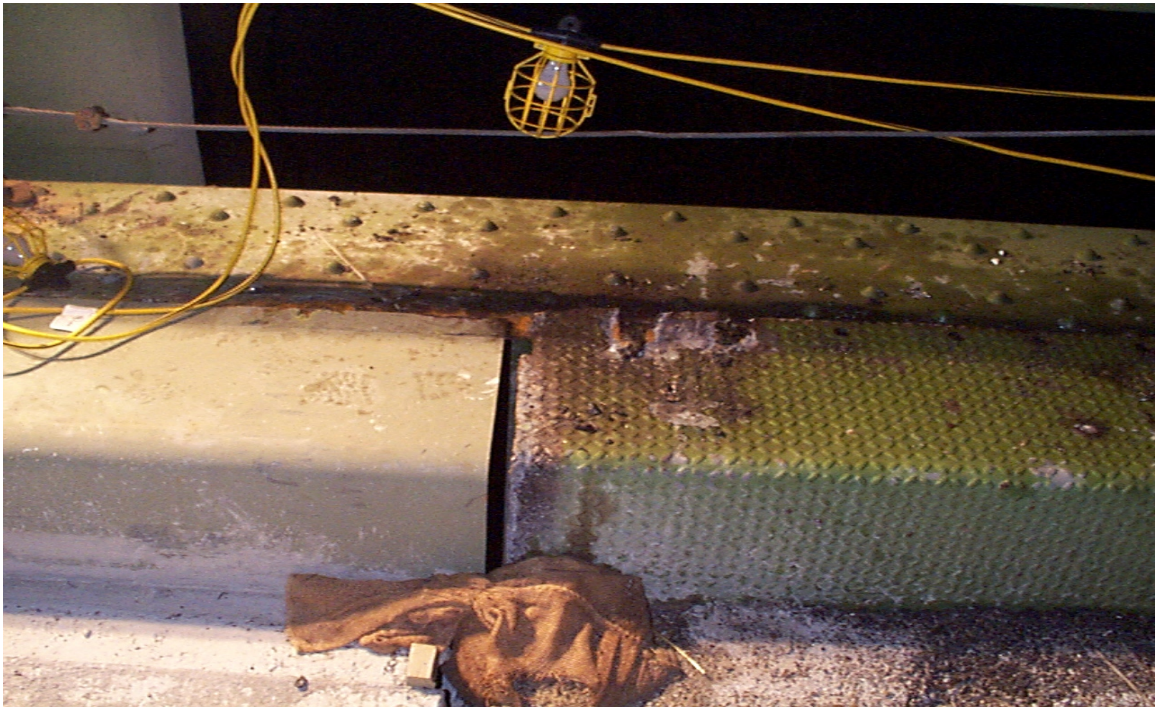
Typical New Curb Plate-Existing Curb Plate Interface
